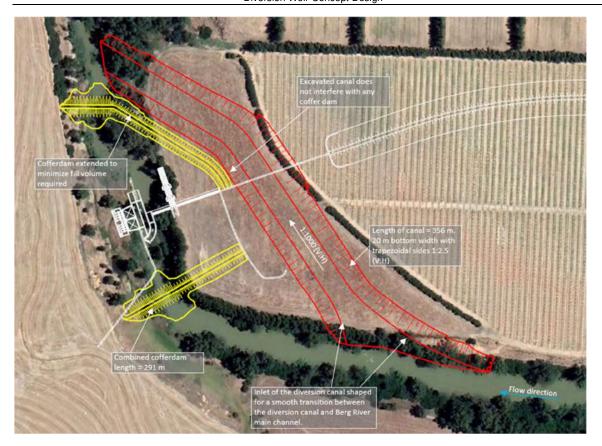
Modified final option C layout with a shaped inlet, straight upstream section and one downstream bend
